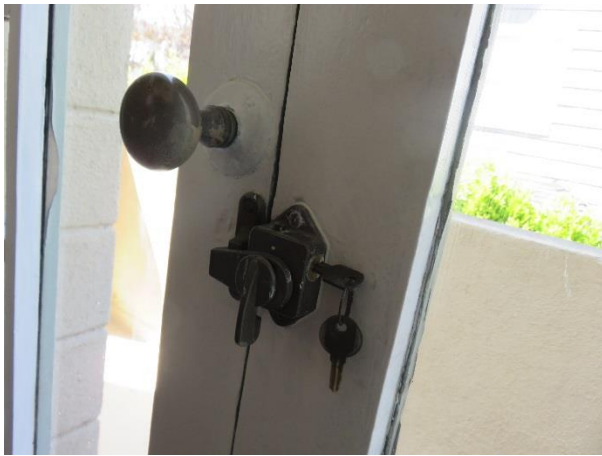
Hardware on the balcony door on the north wall of the northwest bedroom.
